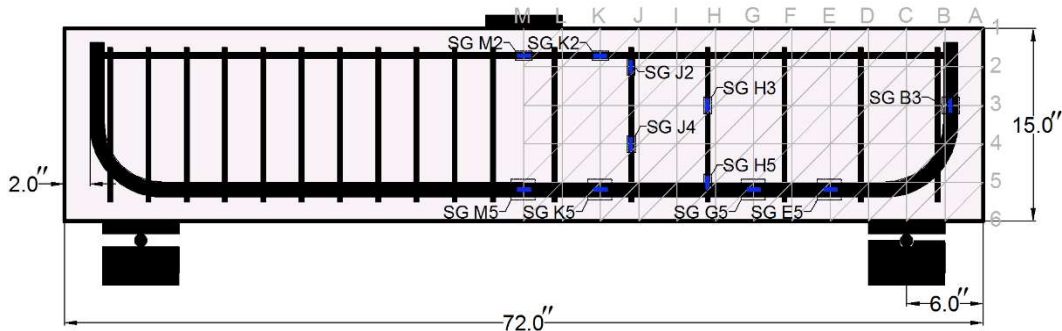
Layout of strain gauges on reinforcement of typical RCS beam
